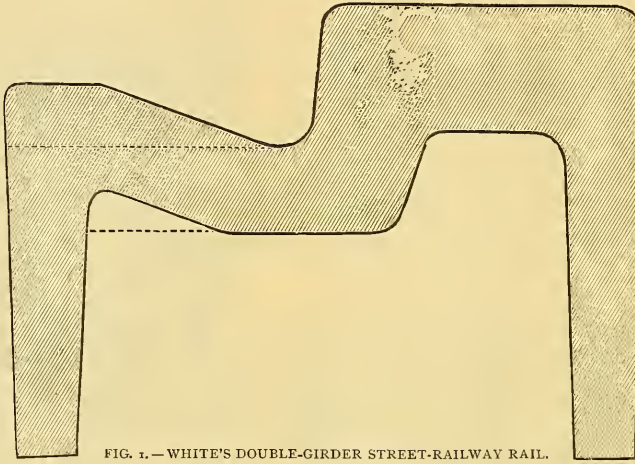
WHITE'S DOUBLE-GIRDER STREET-RAILWAY RAIL.
